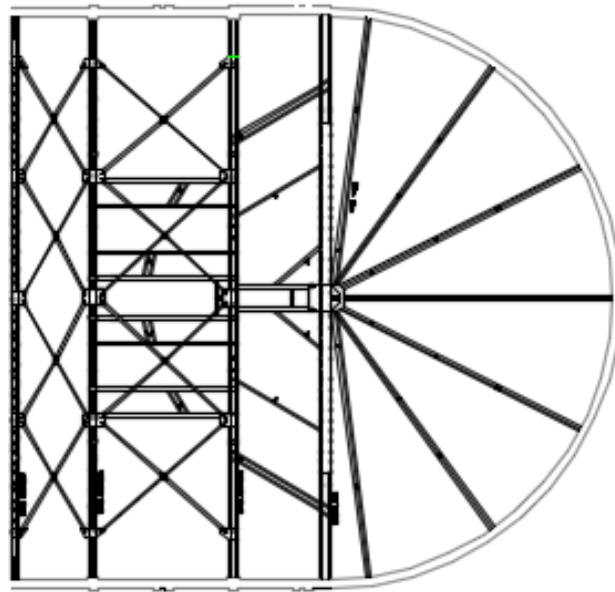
Plan of the metallic structure of the roof over the main vault (Adapted from Cerne Engenharia e Projetos, 2006a)
